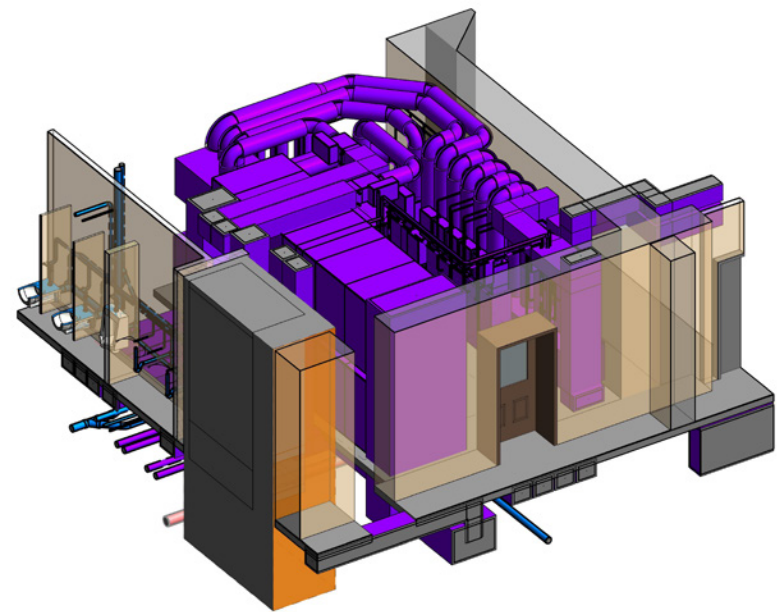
Typical Garden Level Mechanical Room - 3D
